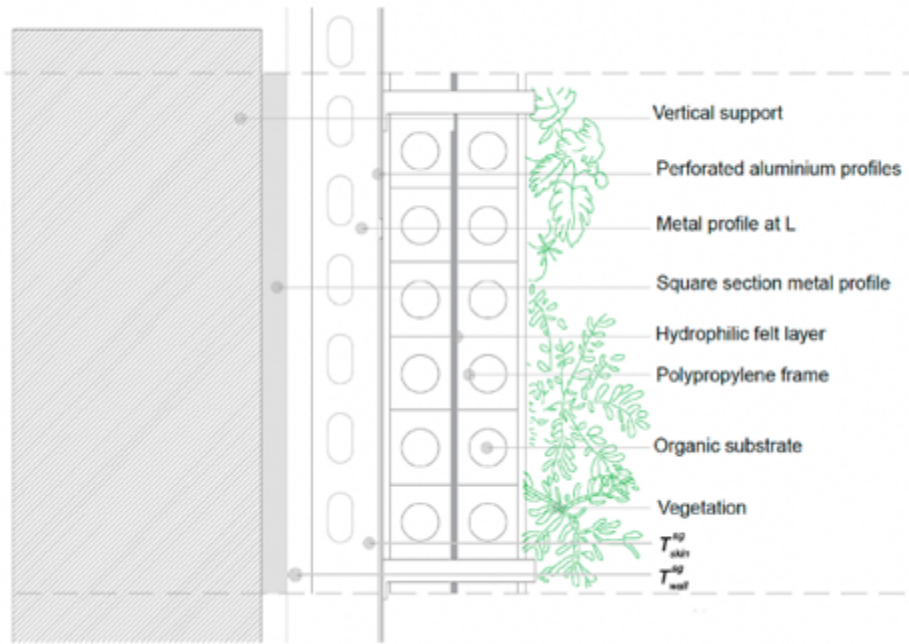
Section detail of the green wall installed in the itdUPM used for the study
